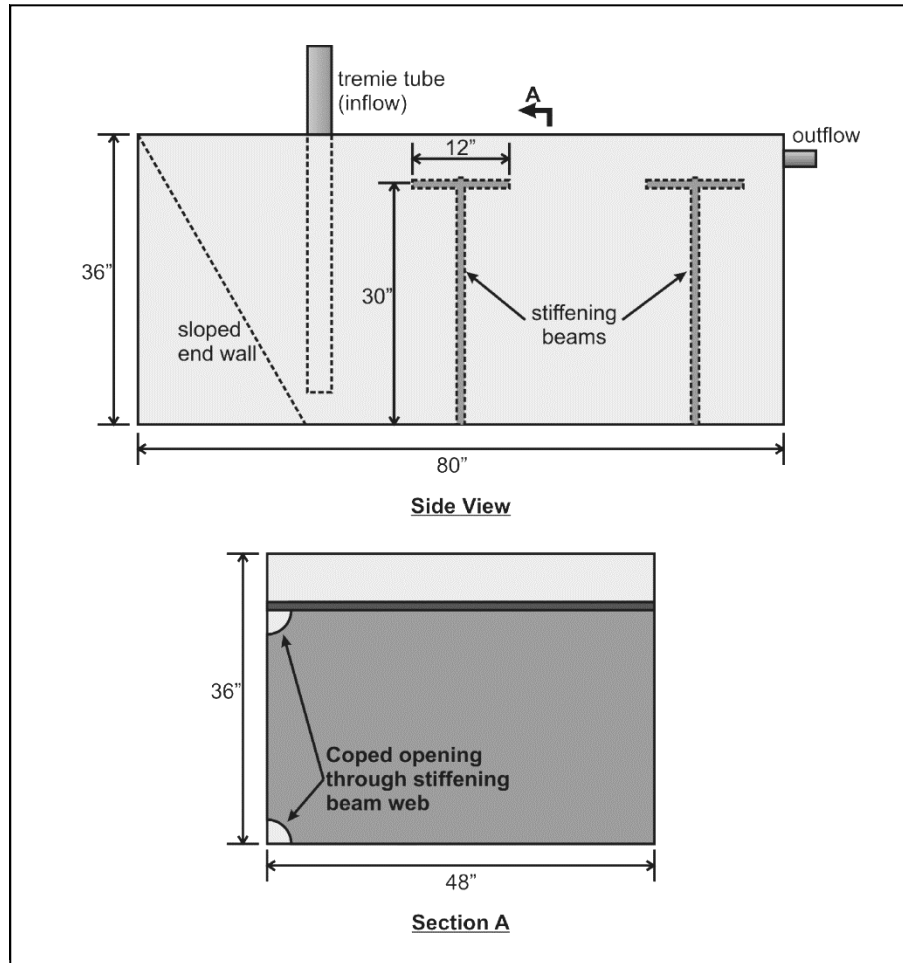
Details of steel tank mock-up used for grouting trial.
